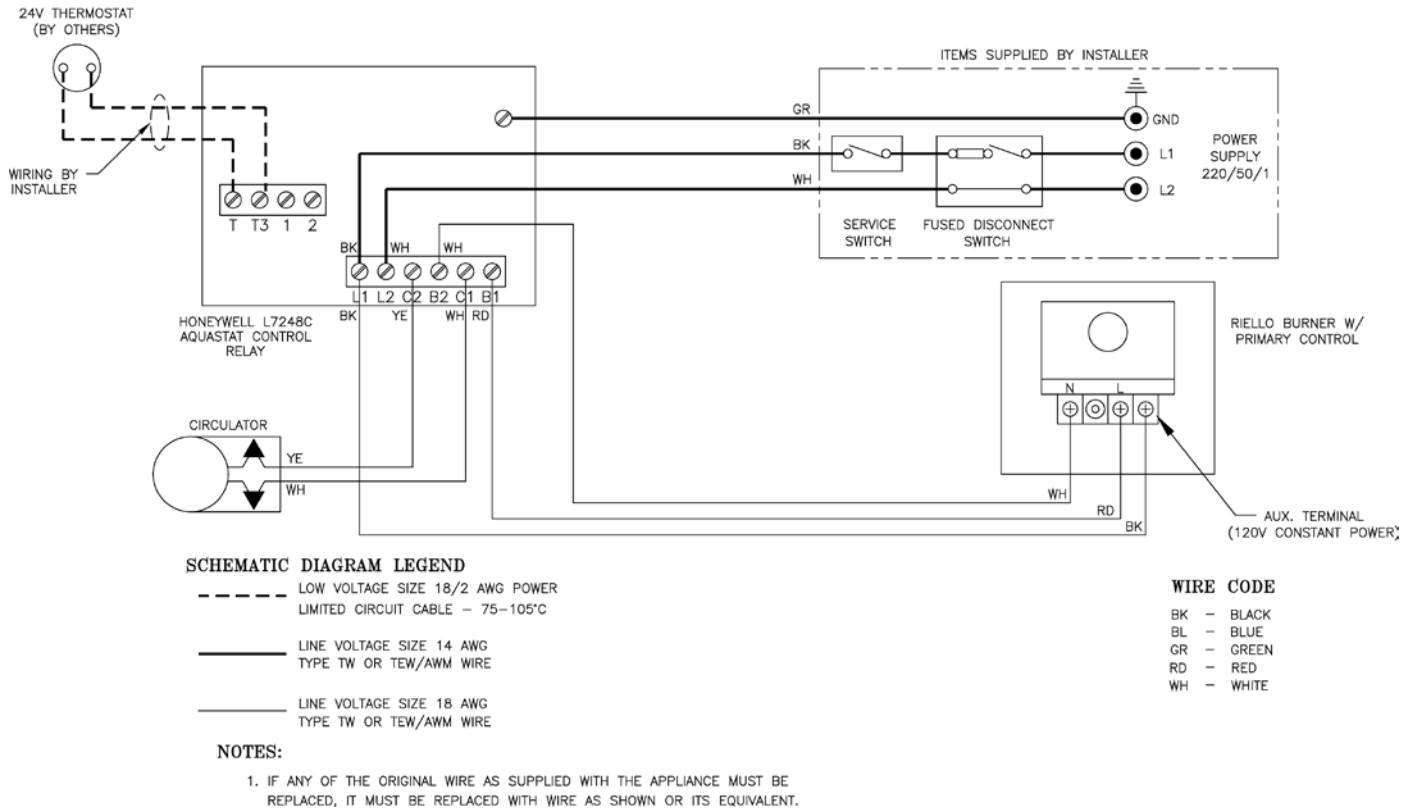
A: AP-U Boiler Wiring Less Tankless, Single Circulator w/Riello Burner
